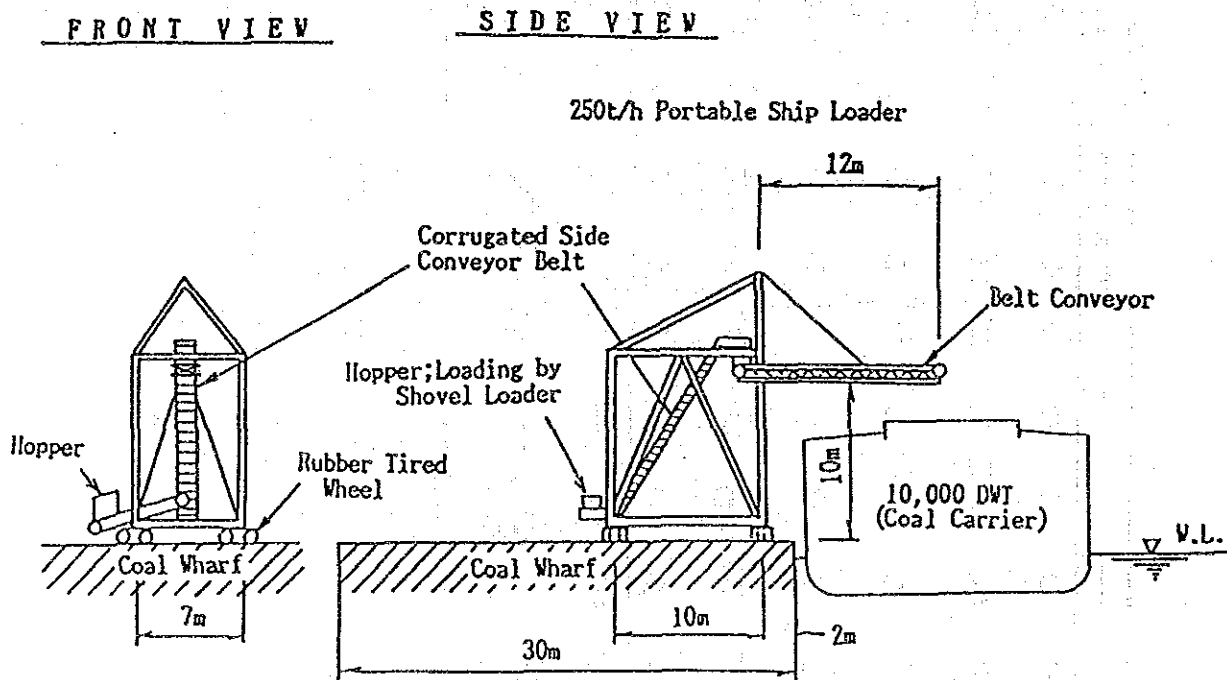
Movable Conveyor System for Coal Loading Operation
